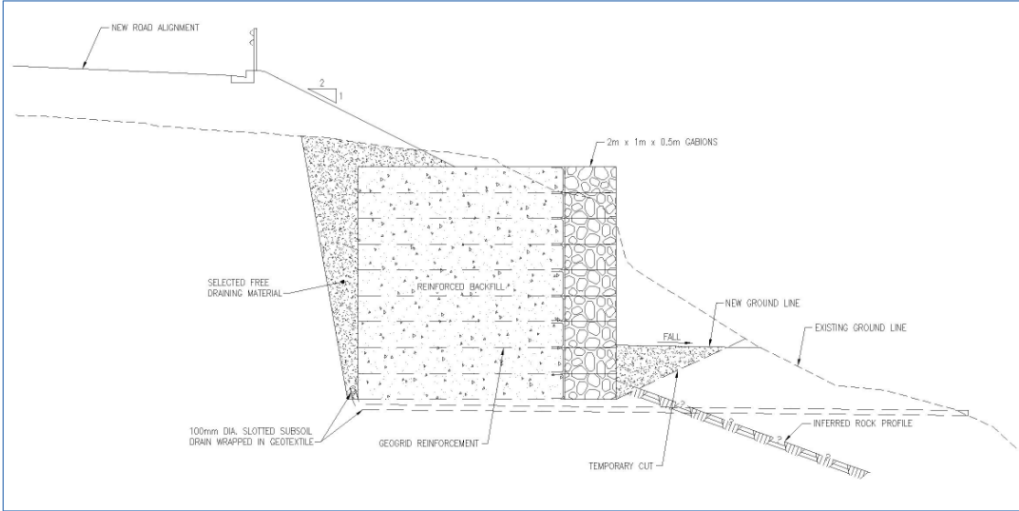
Typical Detail of Reinforced Soil Walls at the Realignment
